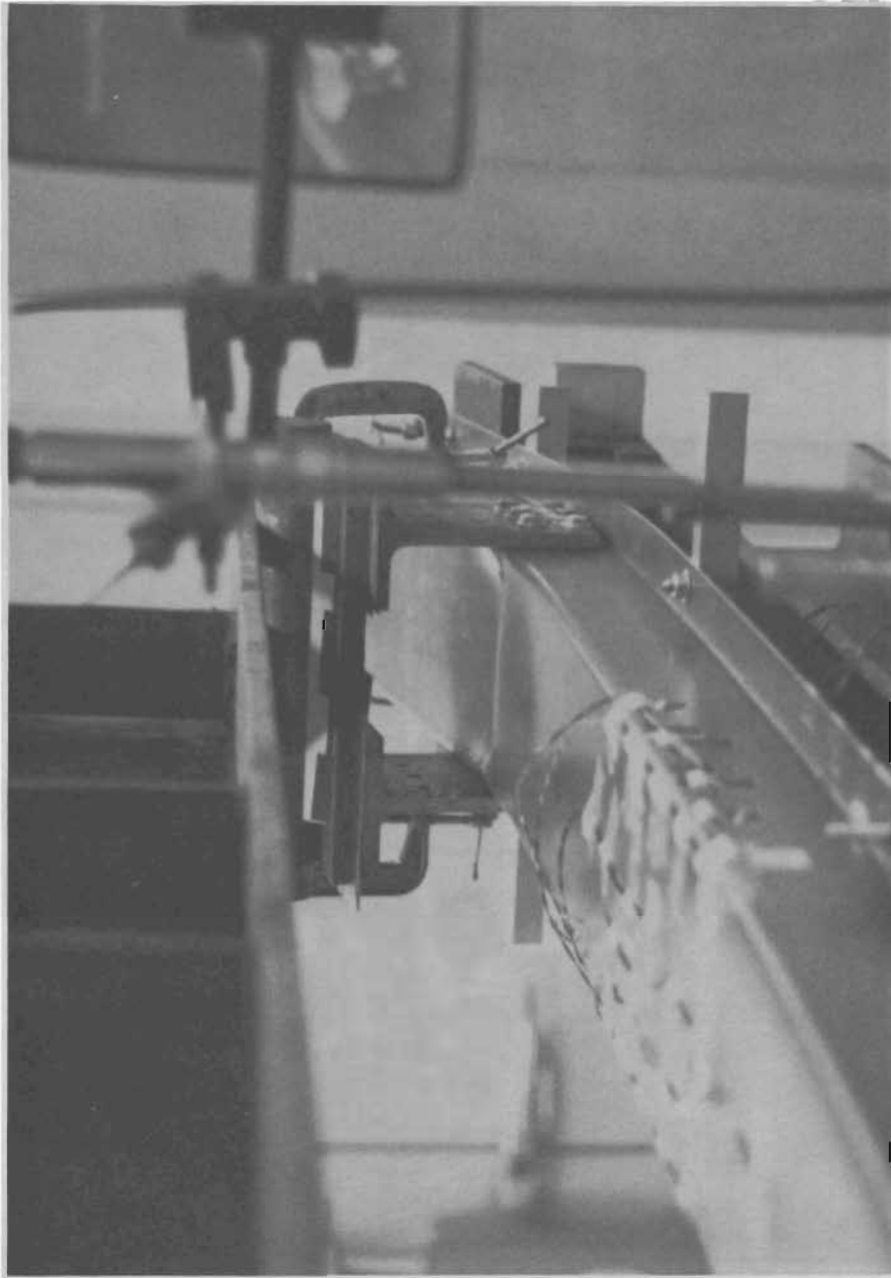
Typical Failure of Hat Beams with a Stiffened Flange
